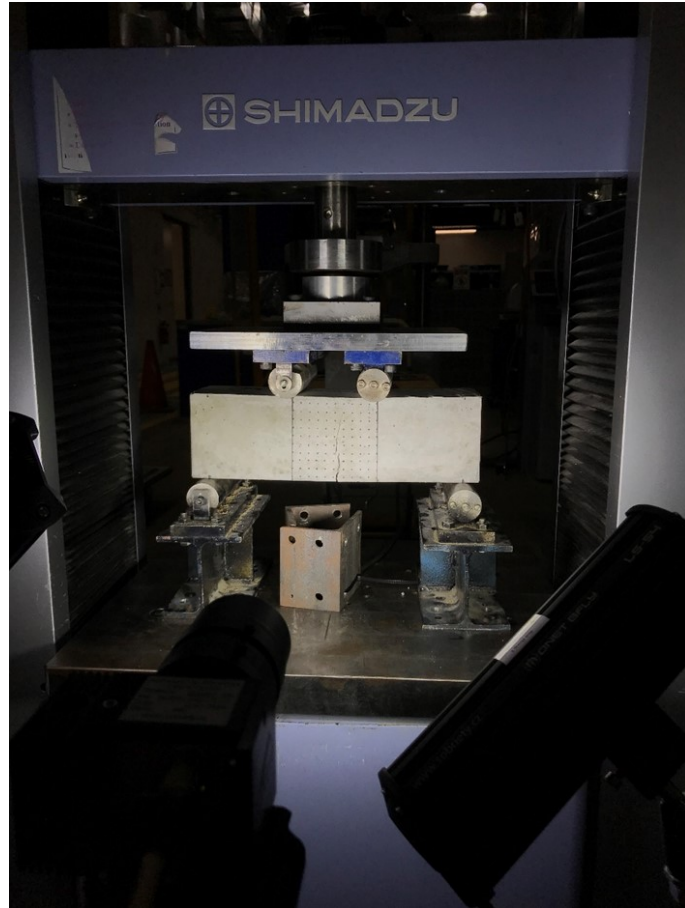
18 Load capacity test results of small-scale reinforced concrete beam with two N5 deformed bars
